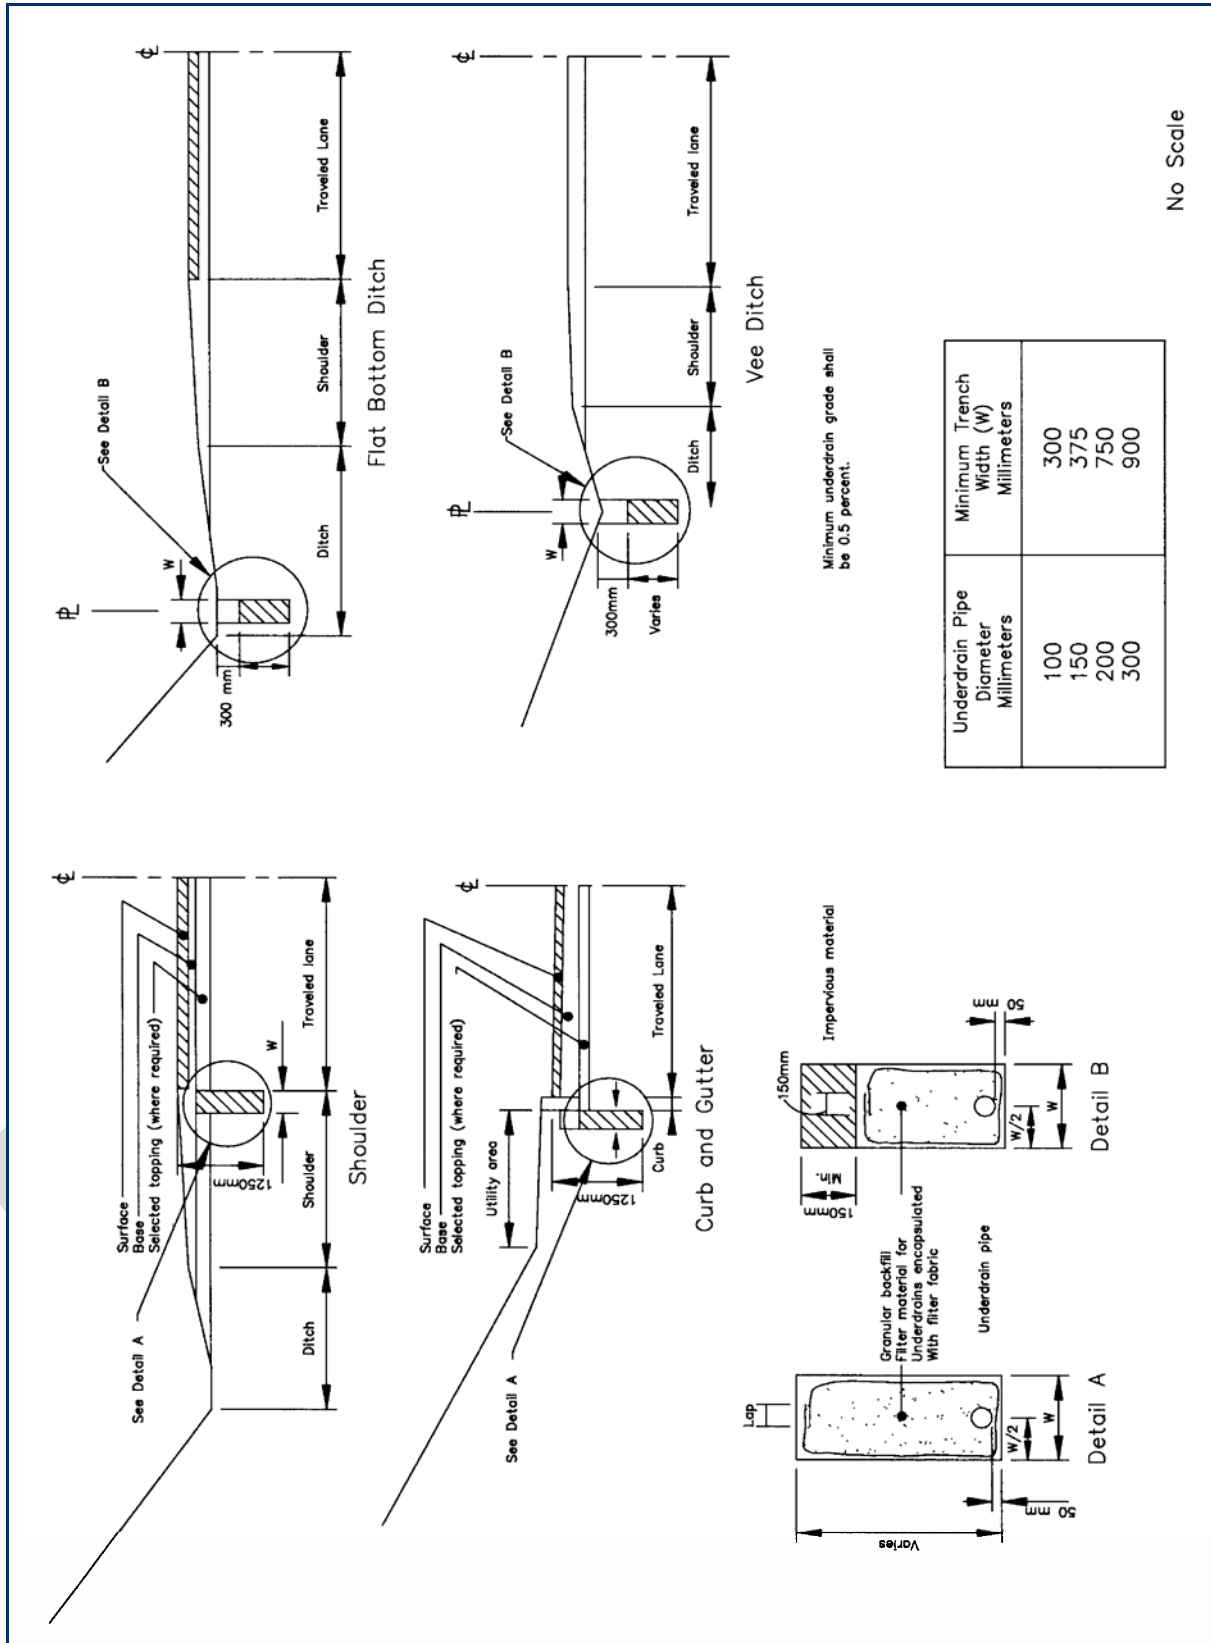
B TYPICAL UNDERDRAIN INSTALLATION IN EMBANKMENT AREAS (Metric)
